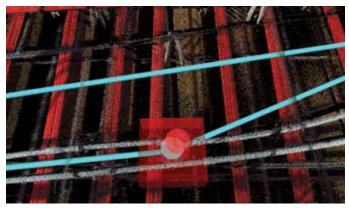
Laser scan of poured slab showing PT tendons and reinforcement. Contractor wanted to repair broken embedded electrical conduit by coring a small partial depth hole through the existing slab.
